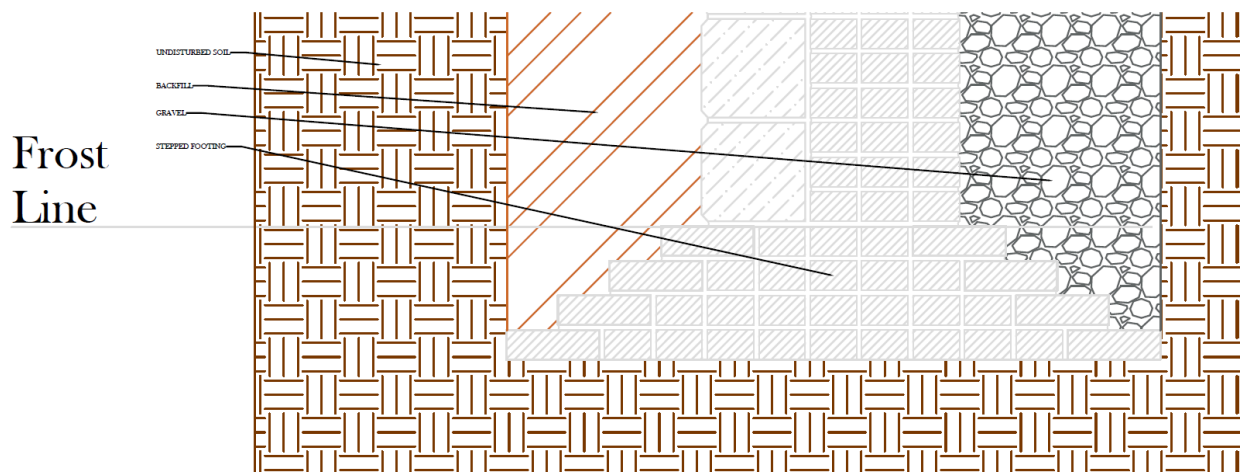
Stratton Hall Schematic Drawing 2-Wall to Foundation Section
